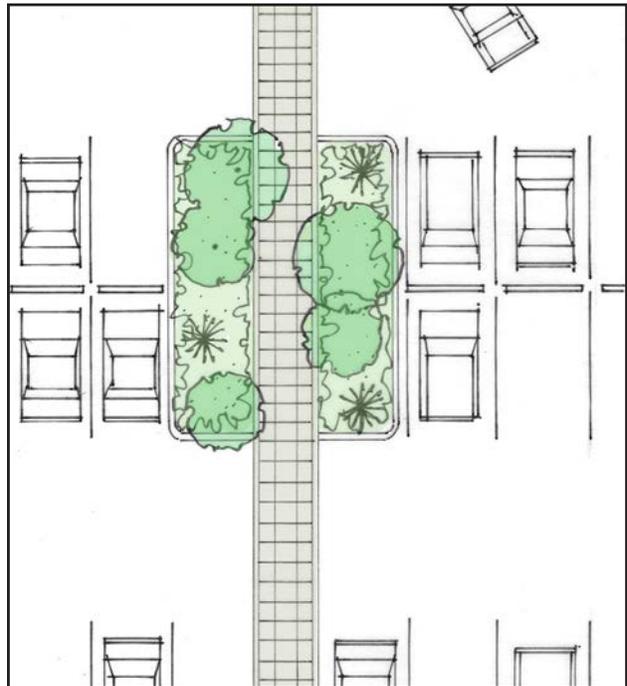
d.4: Minimum 5-foot walkway with scoring
